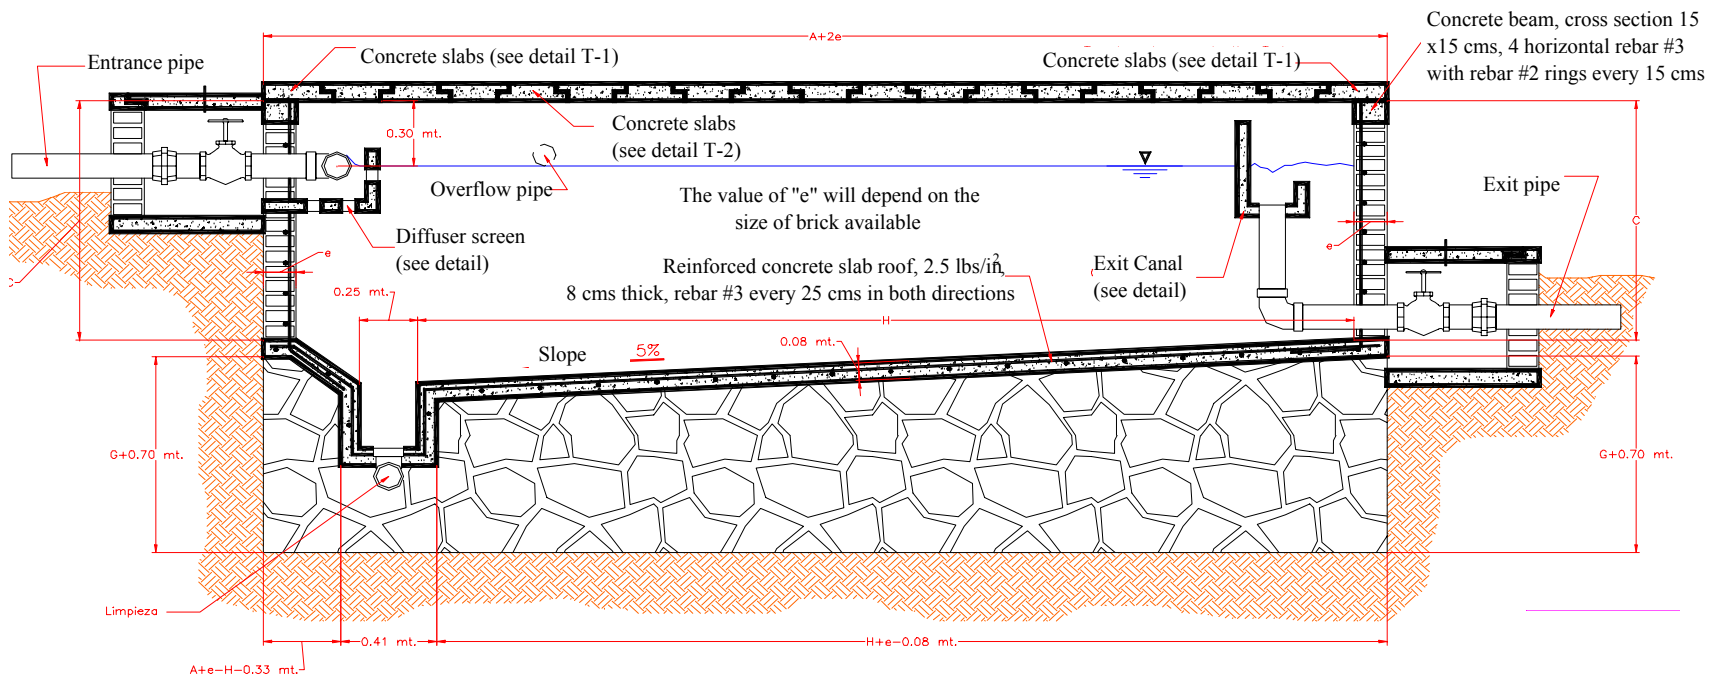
Plan view of sedimentation tank with details on concrete slabs used to cover tank and valve boxes.
